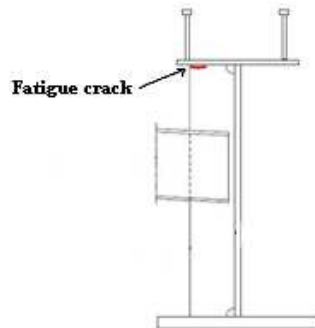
Location of fatigue cracks, James & Kärrfelt, (2009)
